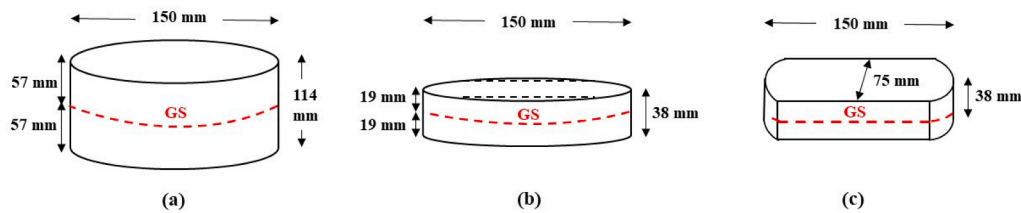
Schematic of brick-shaped specimen preparation: (a) cylindrical sample (before trimming); (b) cylindrical sample (after trimming top and bottom); (c) final brick-shaped specimen.
